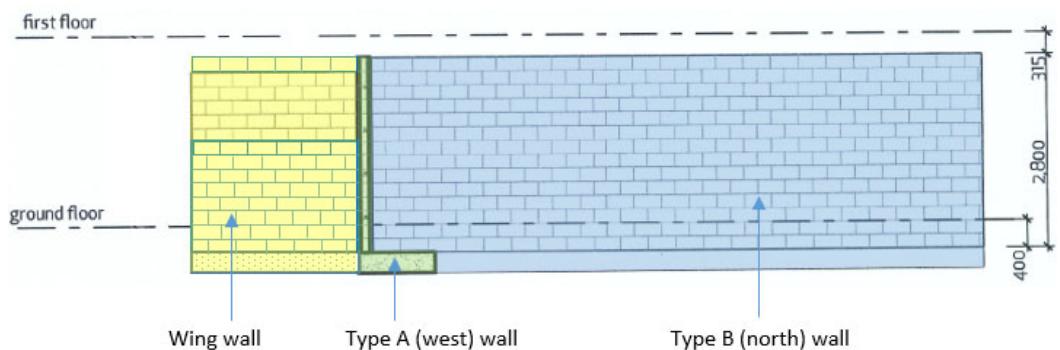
As-built wing wall – Section 1-1 (not to scale)
